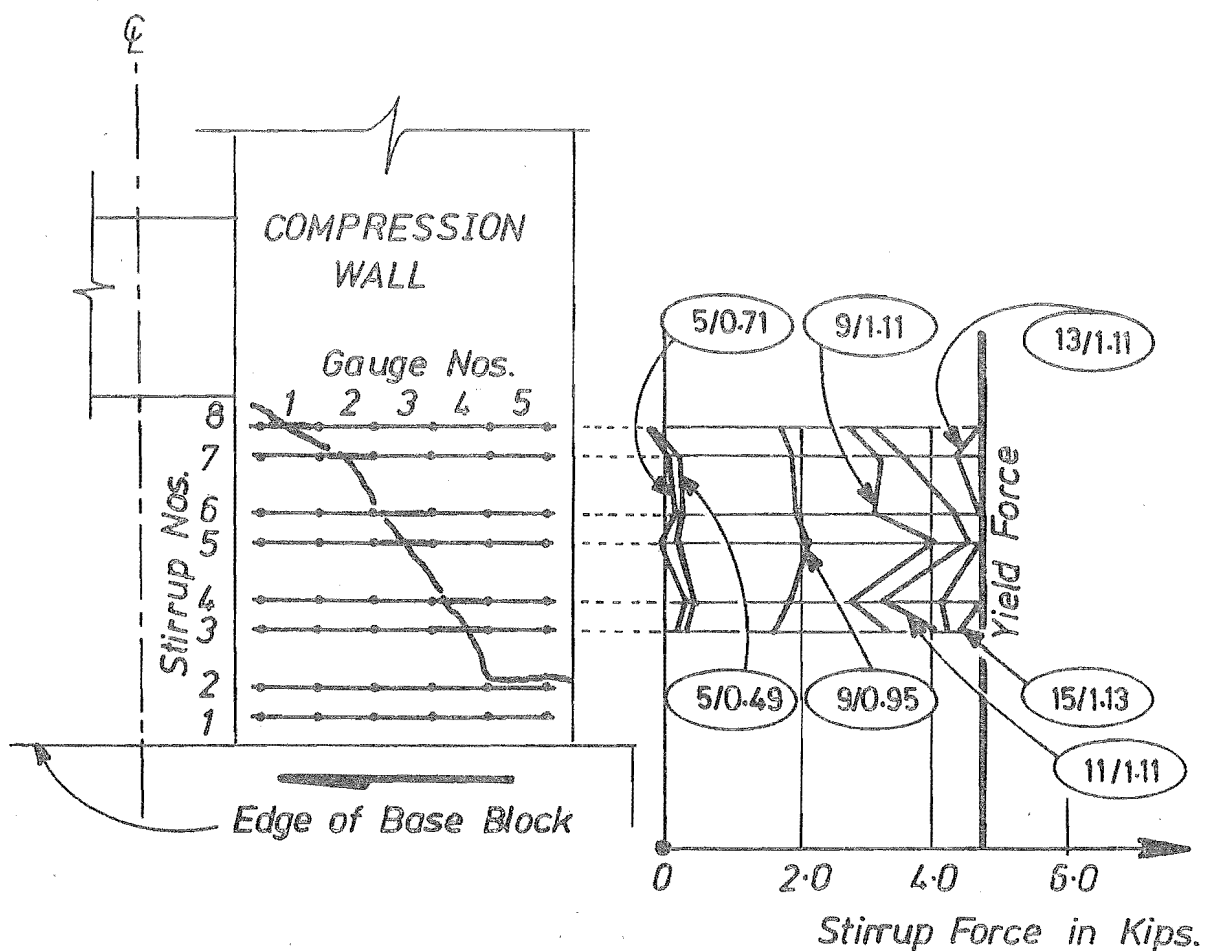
(b) STIRRUP FORCE VARIATION ACROSS A TYPICAL DIAGONAL CRACK IN THE RIGHT WALL
